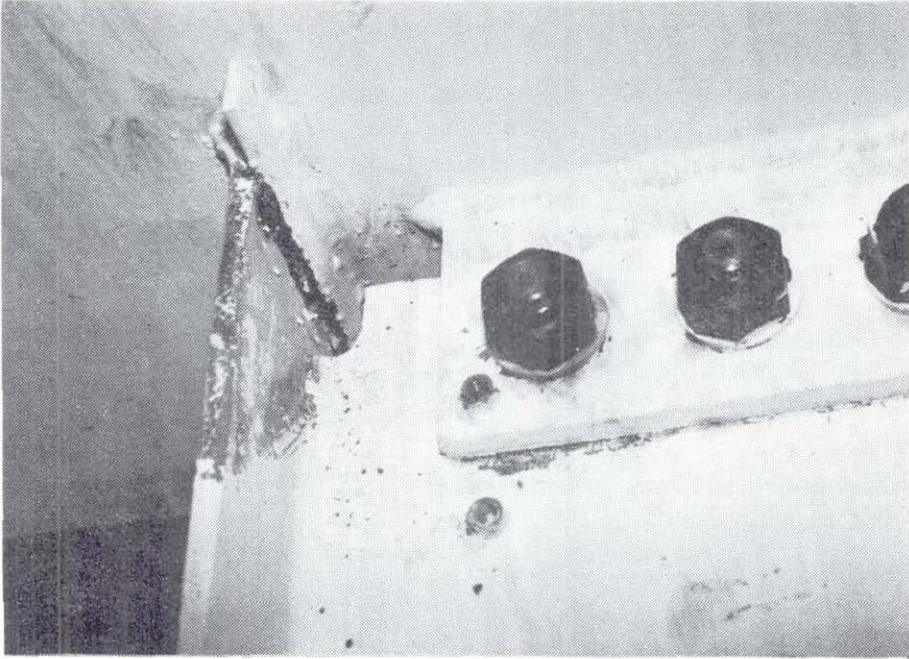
Fracture of Flange Weld (Specimen 16)
